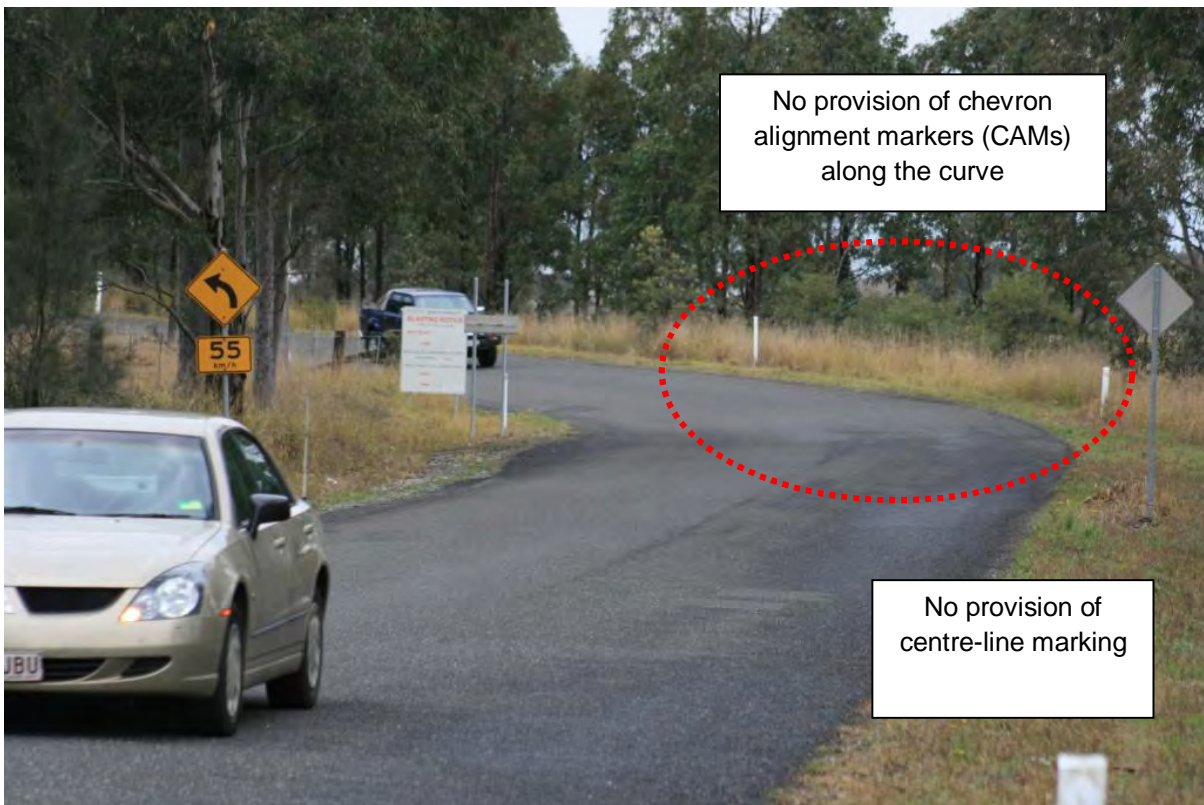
Middle Falbrook Road, looking towards Stoney Creek Road
